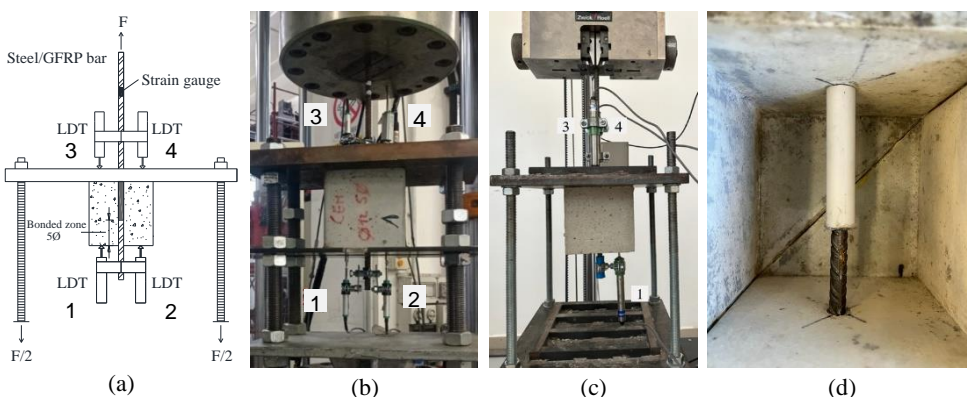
Schematic of the pull-out test set-up (a); set-up at UniSa Lab (b) and UniSal lab (c); specimen before casting (d).
